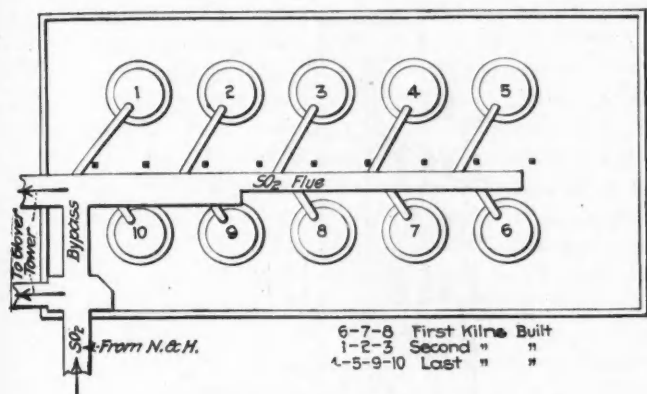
GENERAL SPIRLET FURNACE LAYOUT
